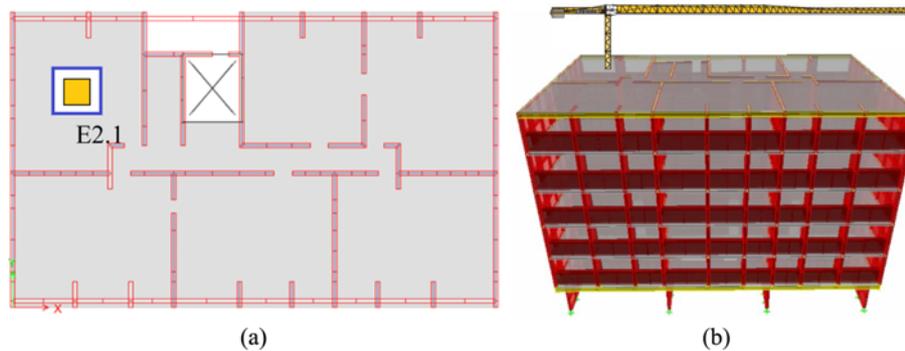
Location of Tower Crane for Type B Building (with opening): (a) Plan View, (b) 3D View
